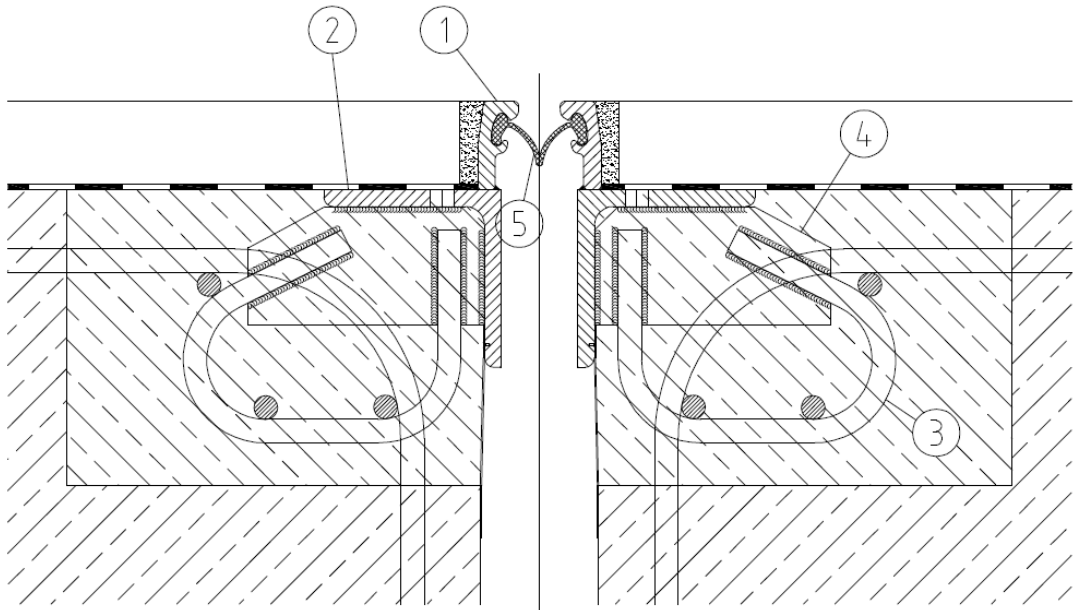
Exemplary cross section of the nosing expansion joint Fahrbahnübergangskonstruktion Typ SP, Type SP, including anchorage, pavement thickness 75 mm
